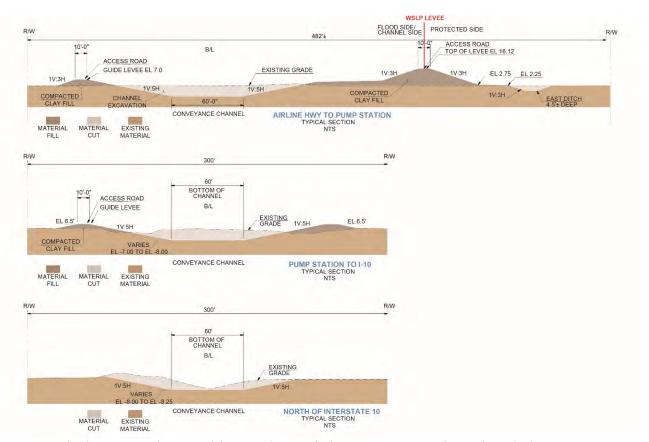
Typical construction corridor sections of the conveyance channel and the WSLP Project alignment from the sedimentation basin to the outfall north of I-10.
